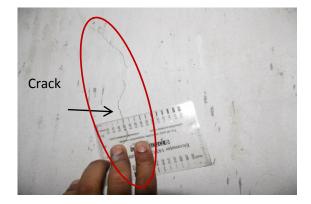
B Inclined Crack on Wall No.2 of Stair GF to UGF of (G.F.), Approx. Width = 0.25mm, Approx.Length =1.2m. Distance from Wall No. 4= 0.3m, Height from Floor = 0.2m.
